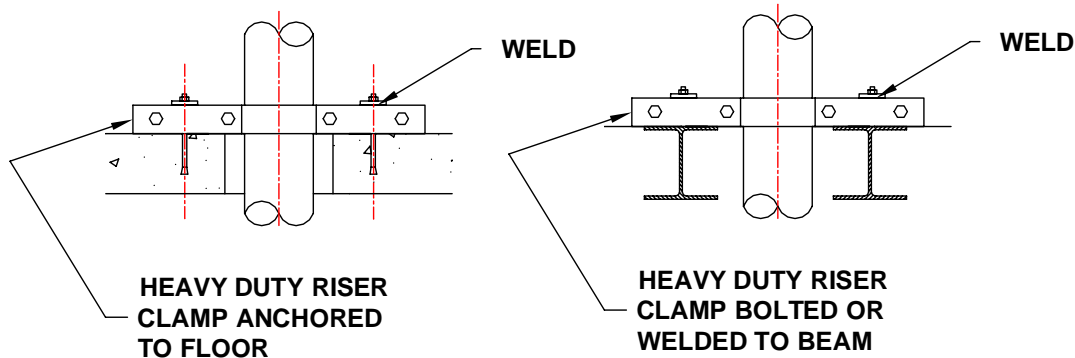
; Perimeter Type Transverse Restraint (Guide) for Vertical Pipe Run
